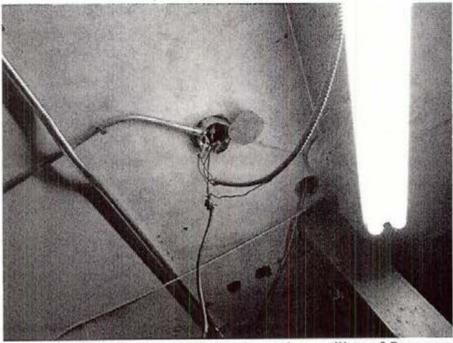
Uncovered junction box located on ceiling of Basement Room 012.
